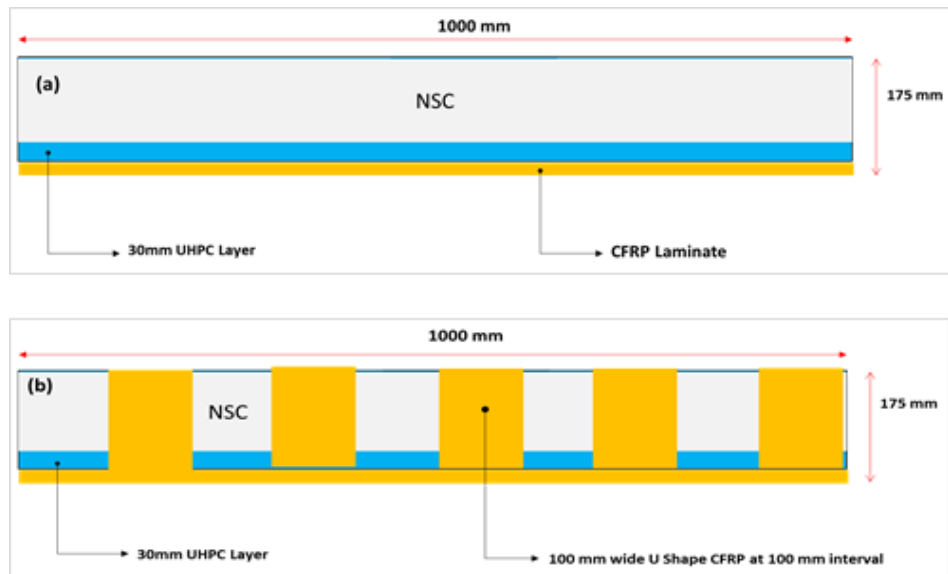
Strengthening Scheme of Specimen RC Beams (a) Strengthened with 30 mm UHPC and one layer of CFRP on soffit (b) Strengthened with 30 mm UHPC and one layer of CFRP on soffit and in U shape on sides
